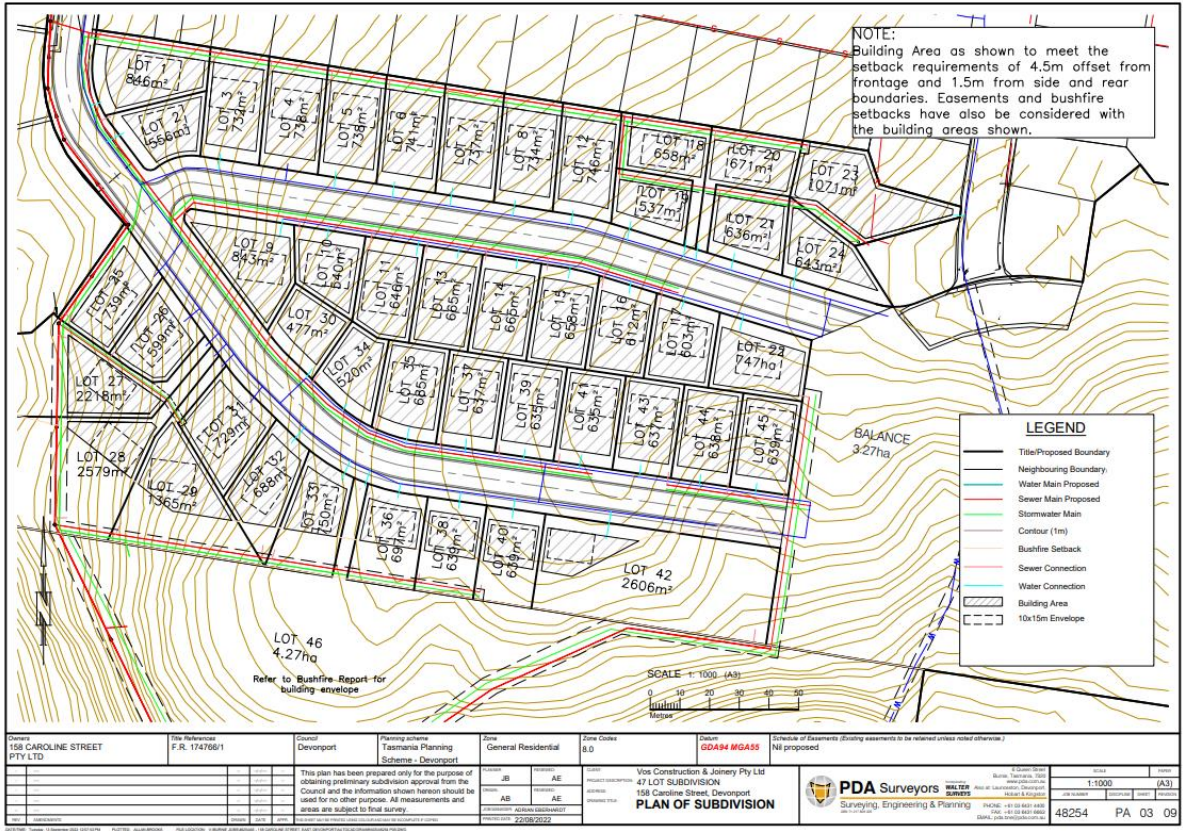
Subdivision plan detail (PDA Surveys, 2022)
